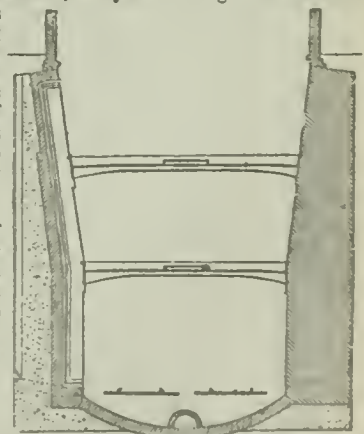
Metropolitan District Railway. Type section of open cutting.
